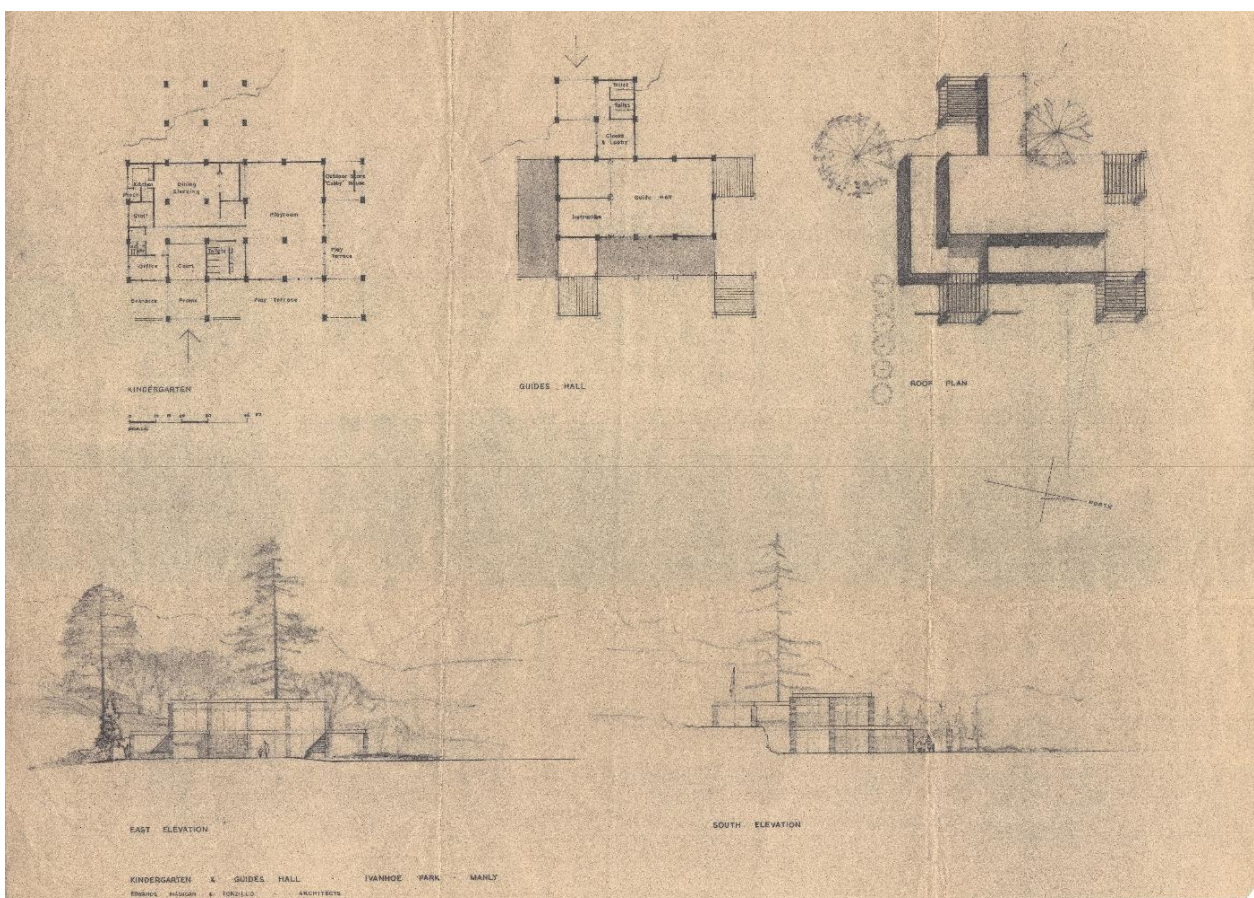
Floor plans and elevations of new kindergarten and guides hall, Ivanhoe Park, Manly, by Edwards Madigan & Torzillo Architects, 1963. (Source: Northern Beaches Council, Local Studies Collection)
